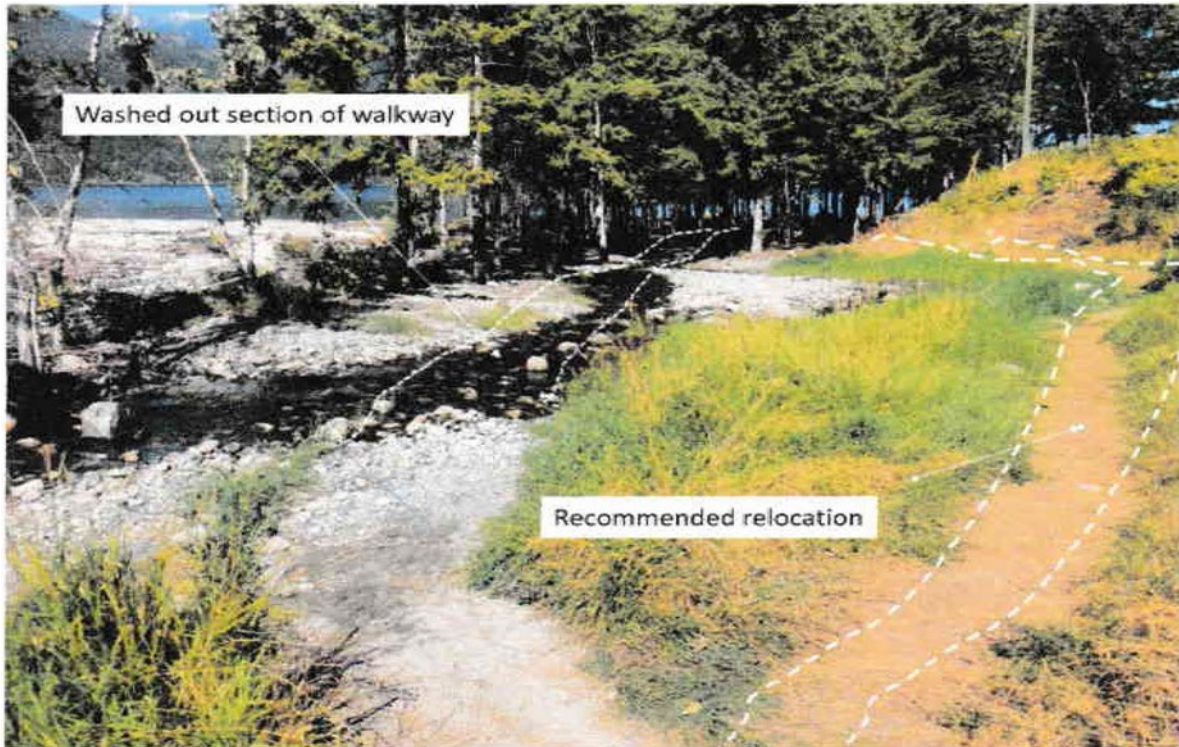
Site I - Walkway Flooding and Erosion August 25, 2020
